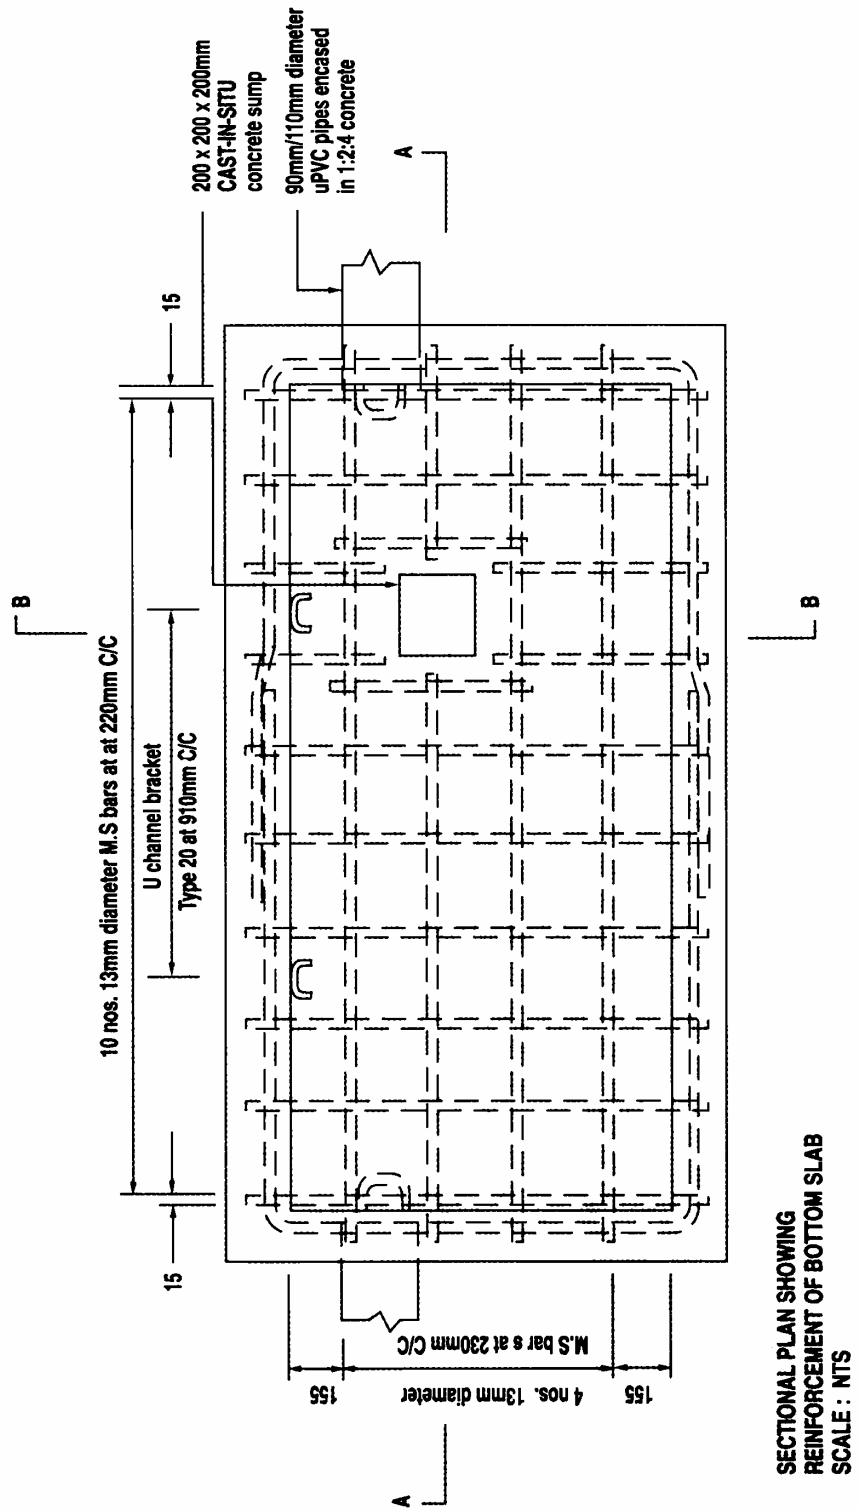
MANHOLE DRAWINGS - TYPE MX2
